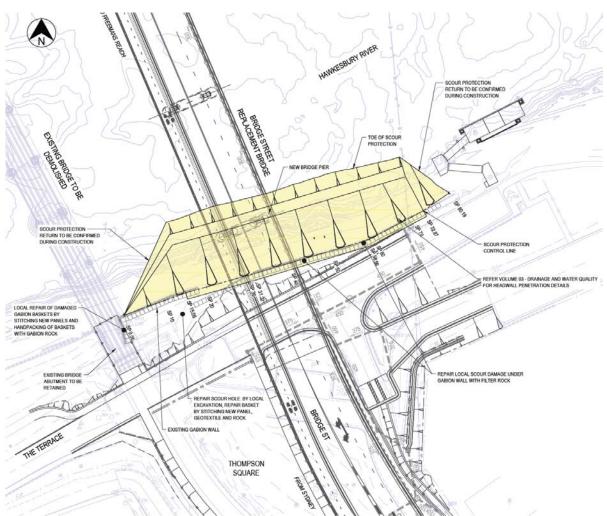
Proposed extent of scour protection on the southern bank and location of southern most bridge piles. <sup>21</sup>
